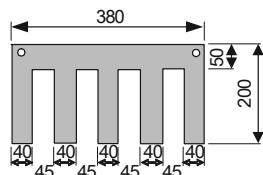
Vertical shape of anchorage plate (connected with quay wall at top left and right by rods; see white circles there)
